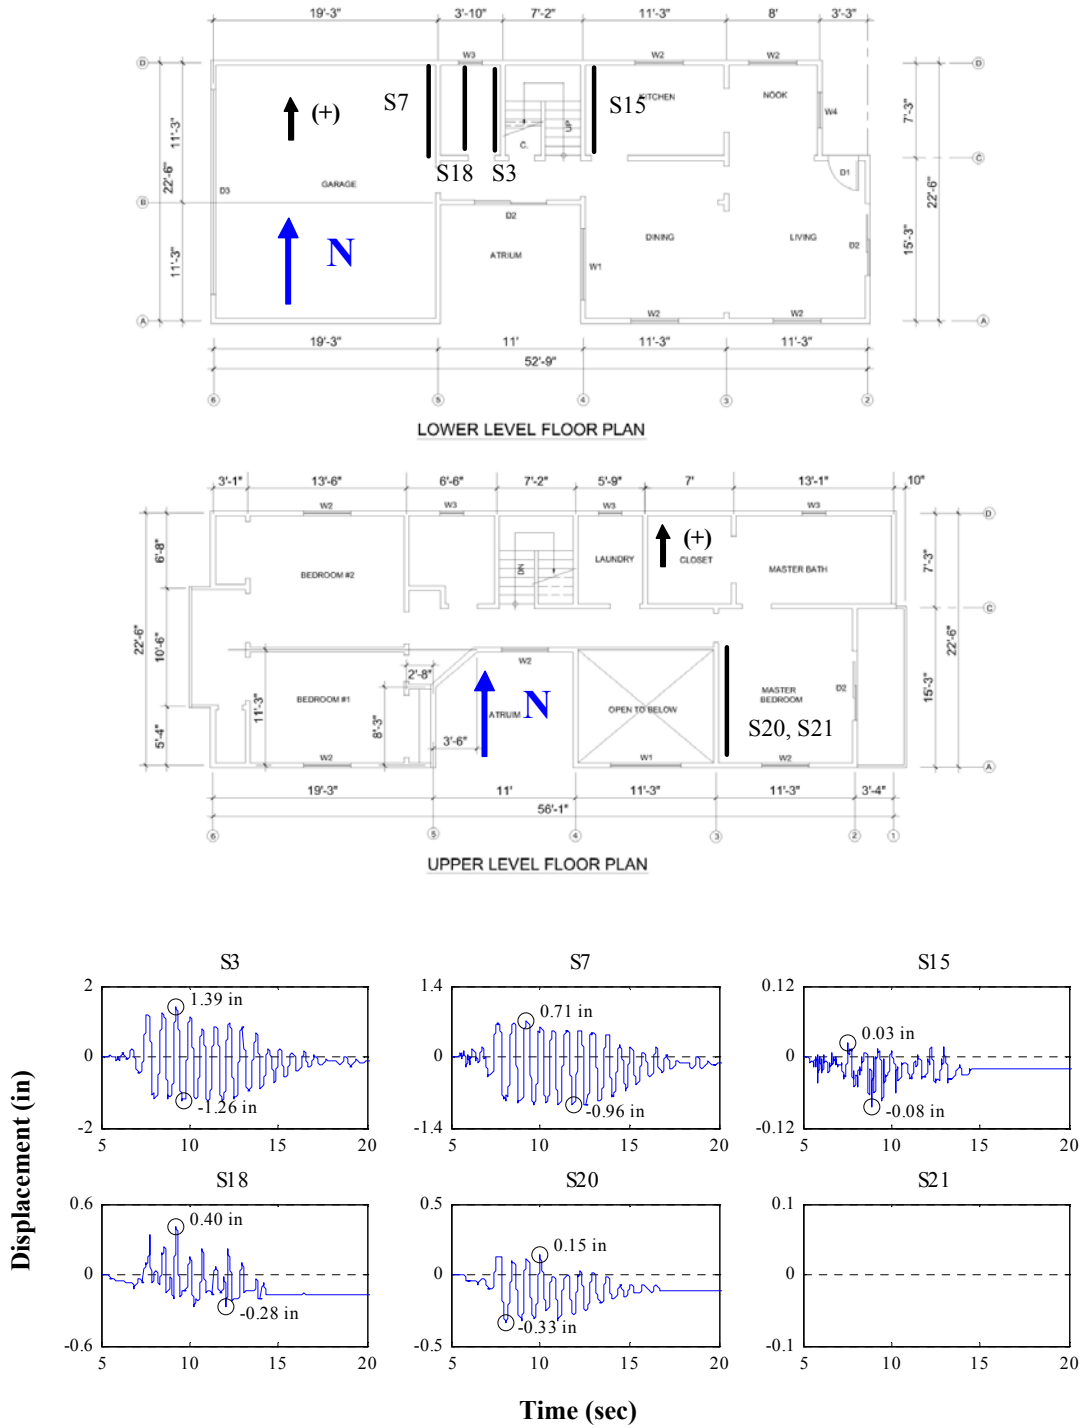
Wall deformations of internal walls for Test NWP5S11
